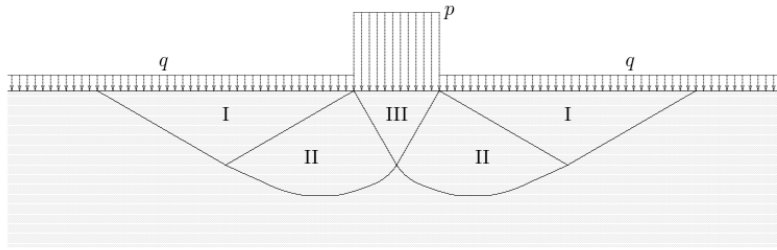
Prandtl shallow strip foundation sliding theory [2]
